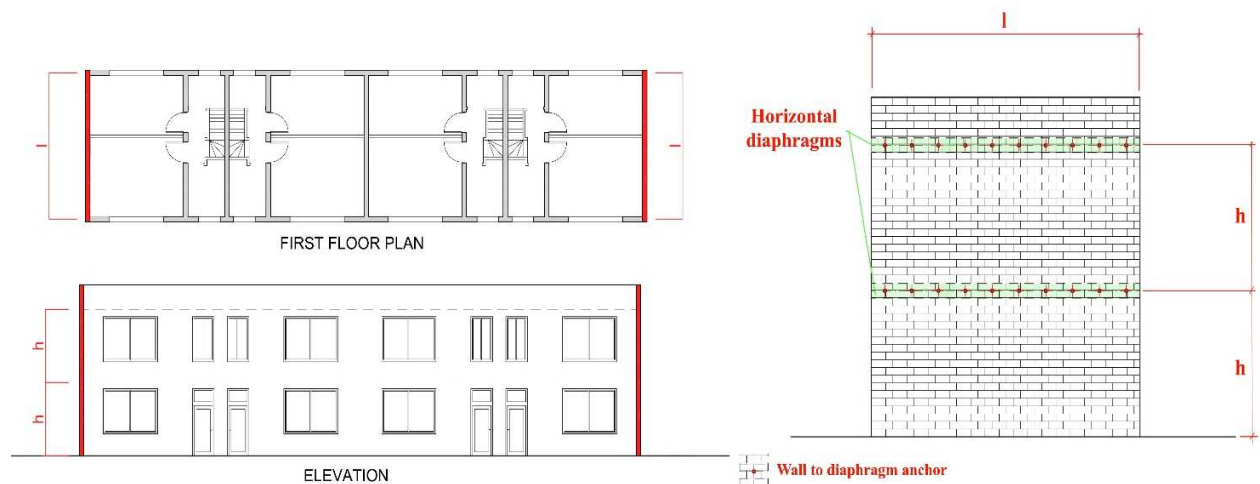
Selected wall panel from a typical Dutch terraced house
